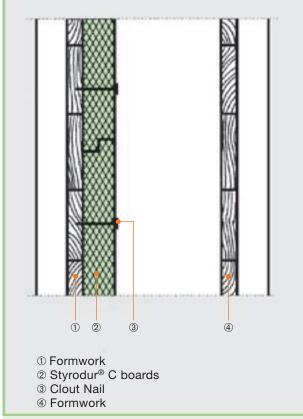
Installation into formwork and fixation of the Styrodur® 2800 C boards with clout nails.
